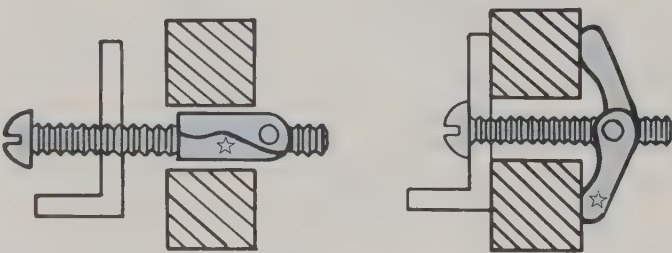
After the toggle bolt is inserted through a hole into the hollow center of the wall, the wings are forced open by spring pressure. The wings are drawn against the inner wall surface by tightening the screw. (Star Expansion Company)
